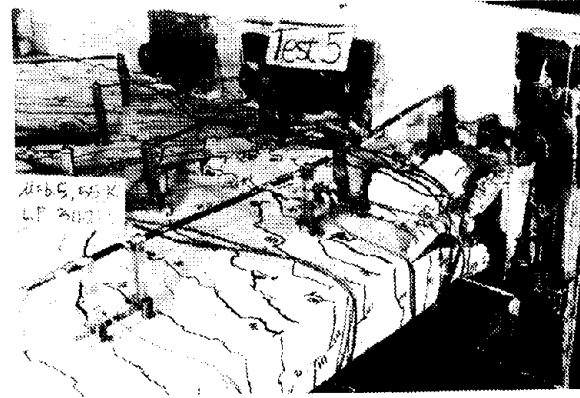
Buckling of Longitudinal Reinforcement at Base of North Column, Specimen 5
